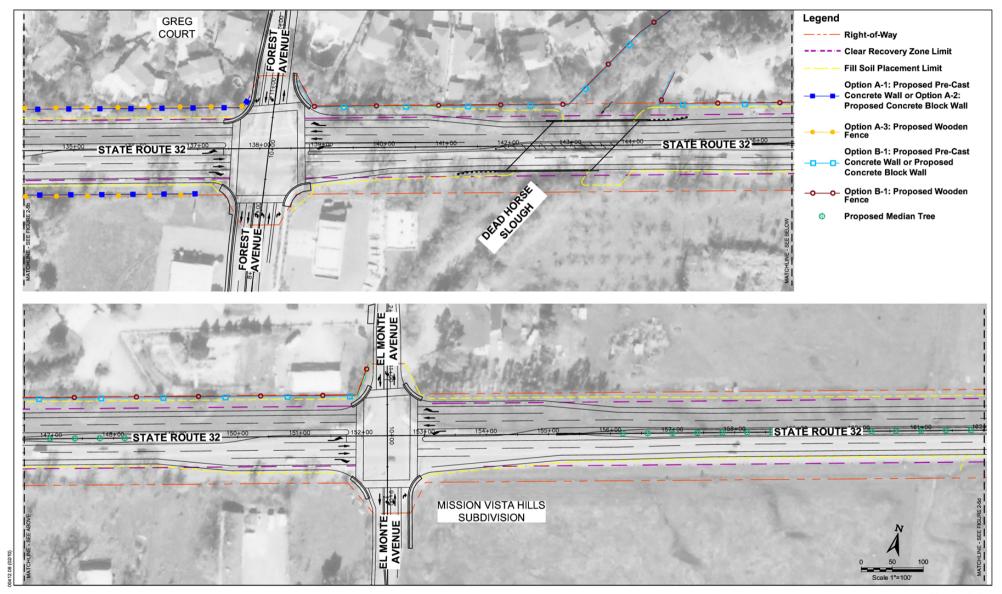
Timber Barrier Alternative, including Proposed Sound Barrier
